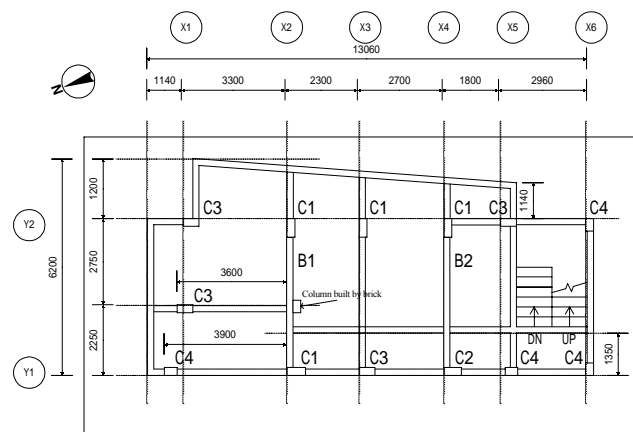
Plan of Building A (AIJ, 2001)¹⁾.
